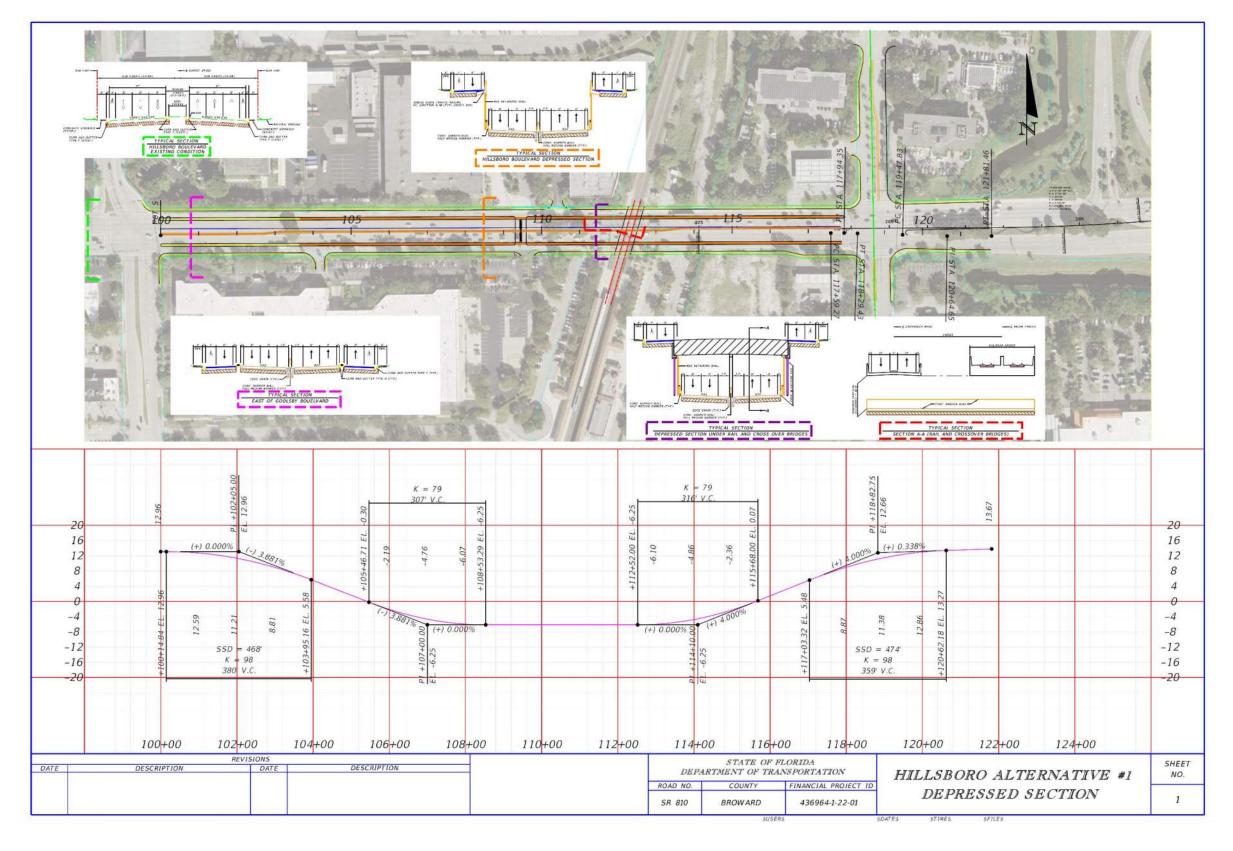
Hillsboro Boulevard – Concept Plan – Alternative 1
